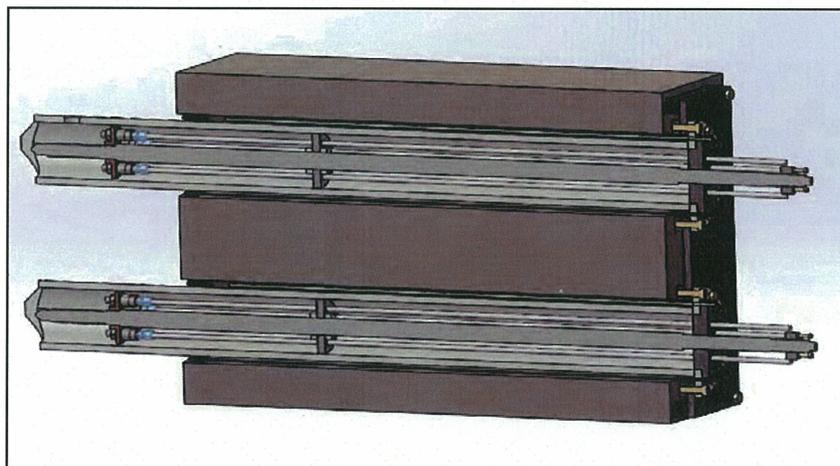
Cross Section of REA Bolt Assembly Installed into Through Supports
